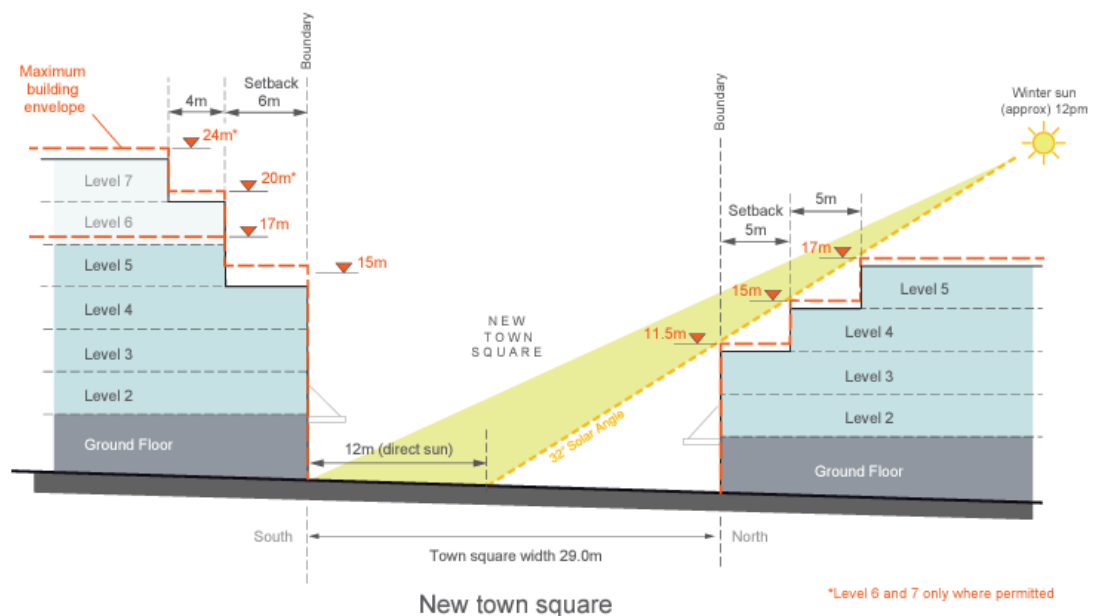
Section illustrating building envelope applicable to land to the north of new town square on eastern side of Great North Road and expanded Fred Kelly Place on western side of Great North Road (Part F, Section D, page F-157)
